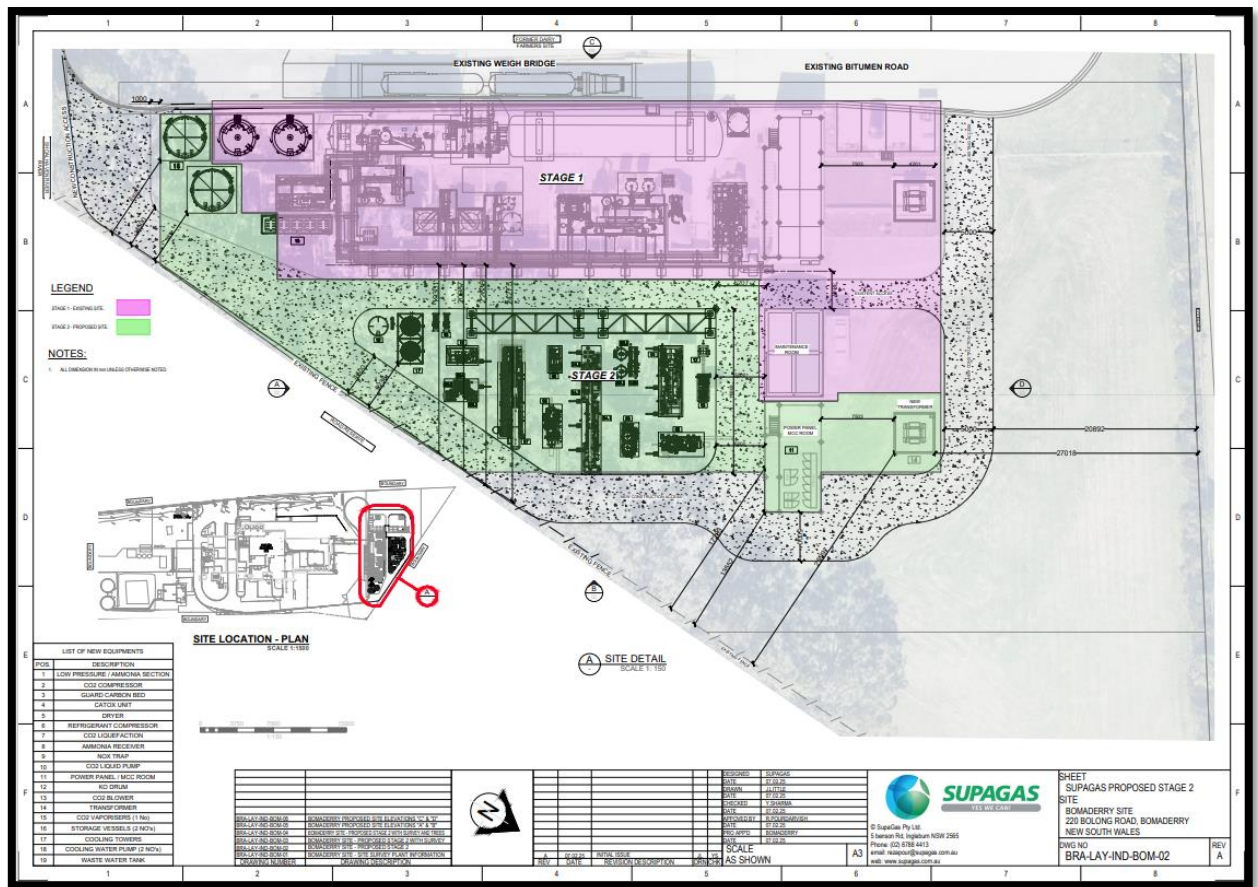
Proposed Modified CO₂ Plant Stage 2 Layout
